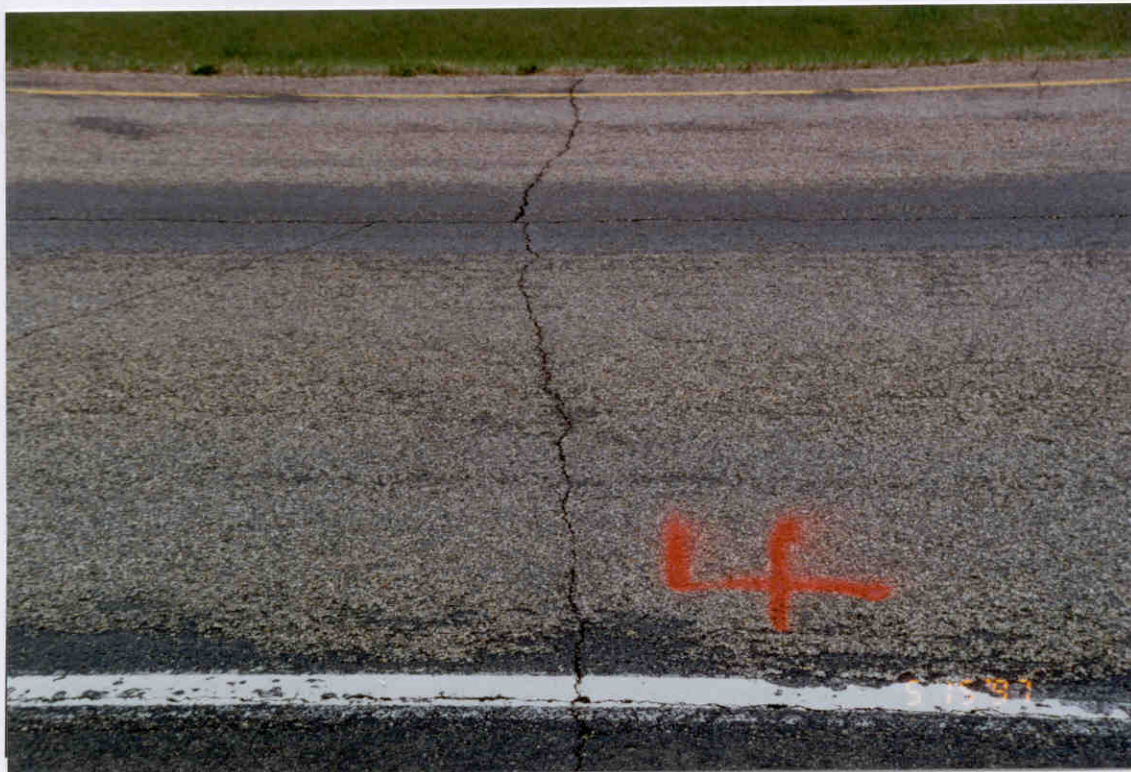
Typical transverse crack in the 4" overlay test section (WB).
